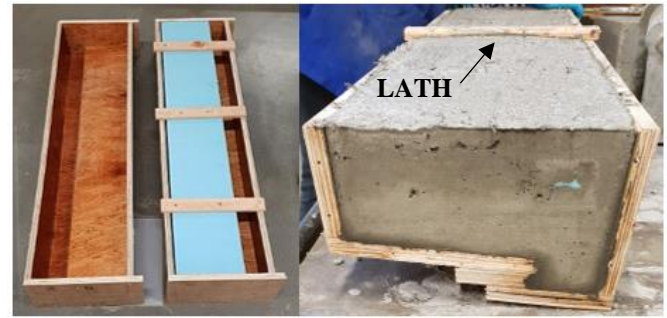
Void sill mould with timber laths and Hollow sill mould being stripped.
